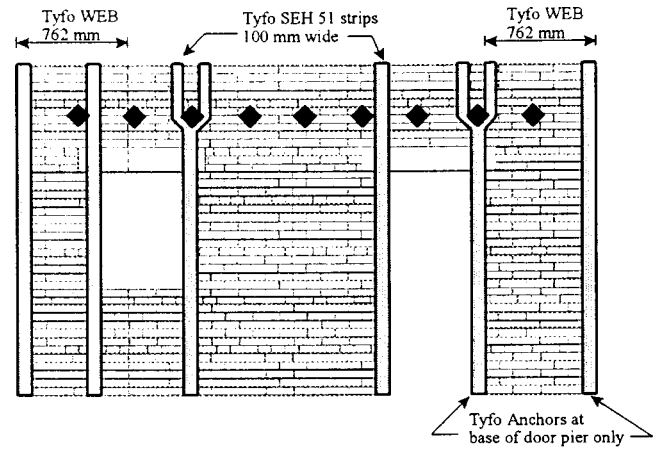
West wall elevation of unreinforced masonry specimen repaired with Tyfo SEH 51 and WEB (the east wall is simply mirror image)
